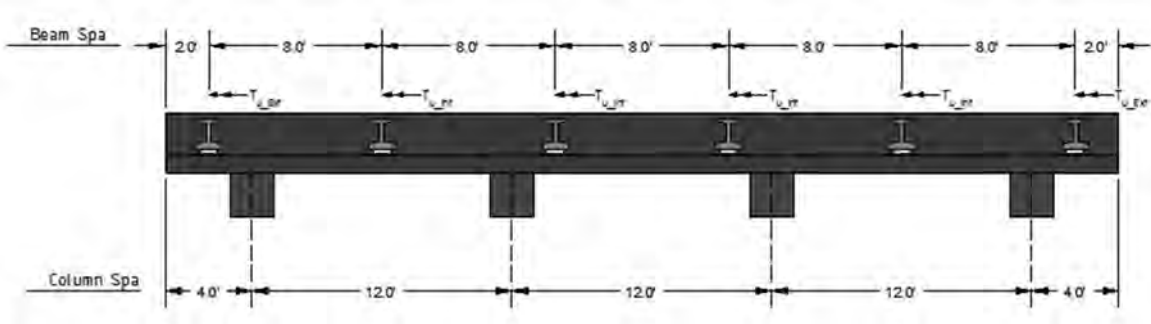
Elevation View of 60 Degrees Skewed ITBC with Torsion Loads
